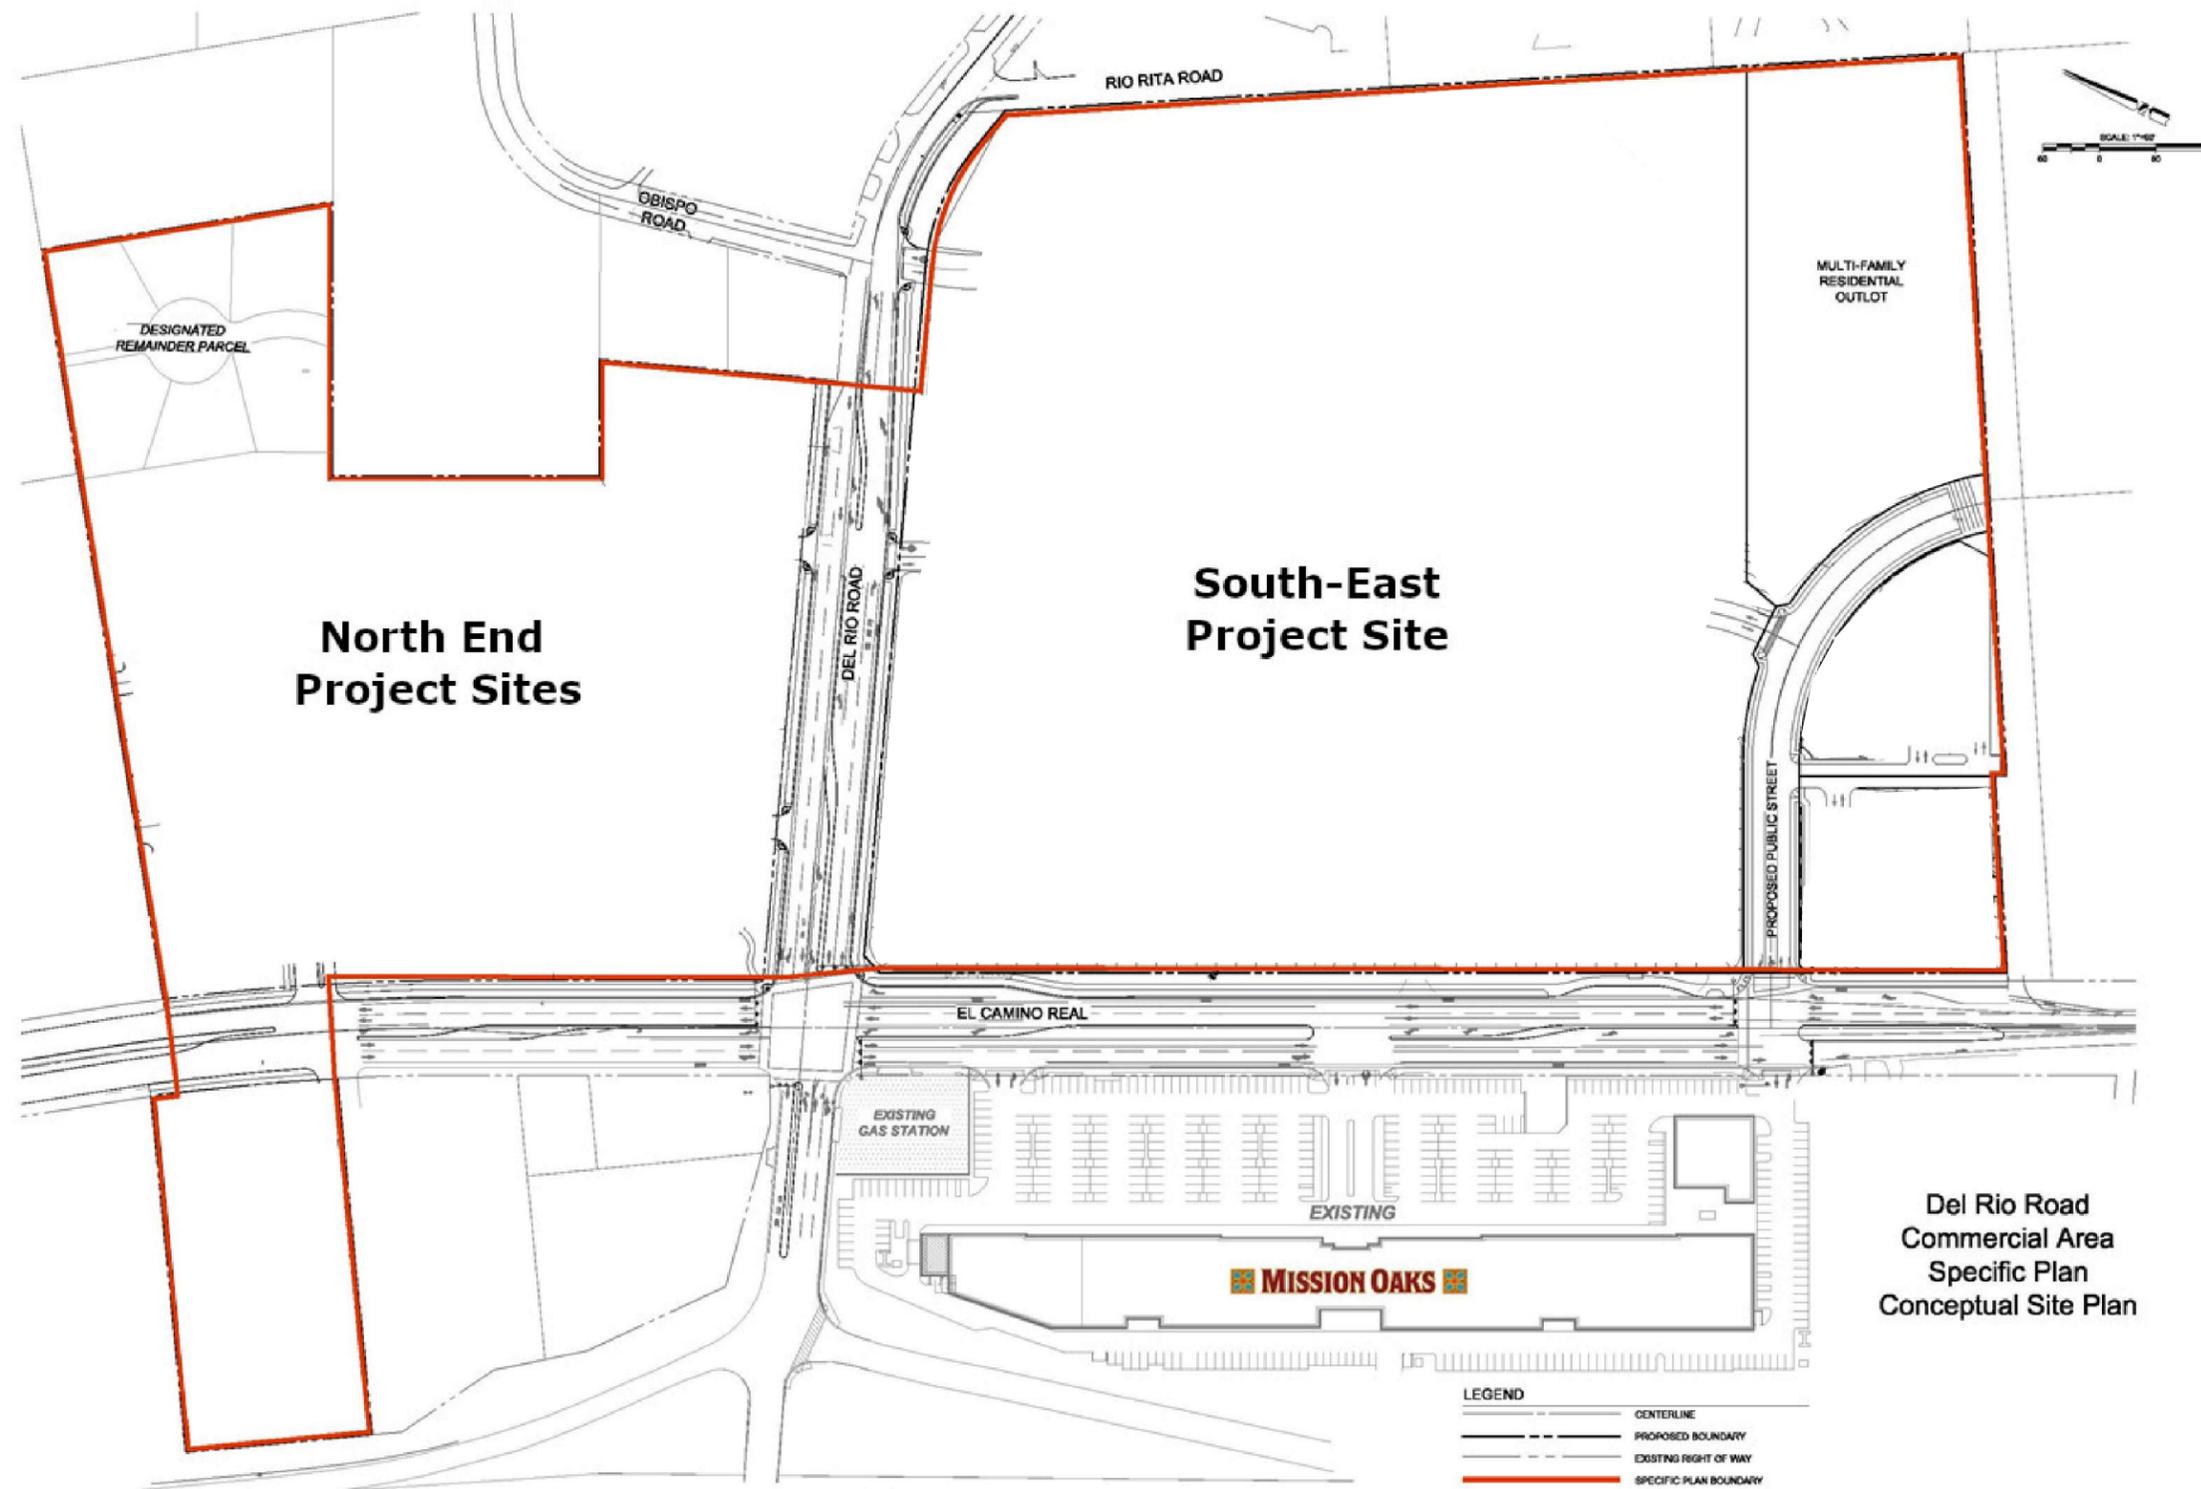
Del Rio Road Commercial Area Specific Plan Conceptual Plan
